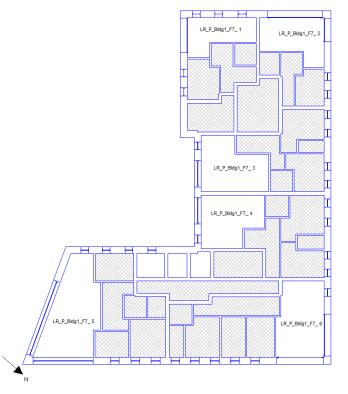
Level 7 living rooms in Building 1 (larger plan in Appendix A)
